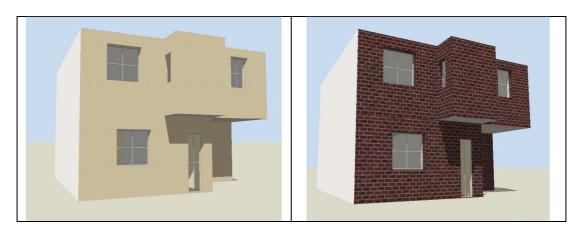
Building model with two types of coatings: Belitic cement and brick masonry
